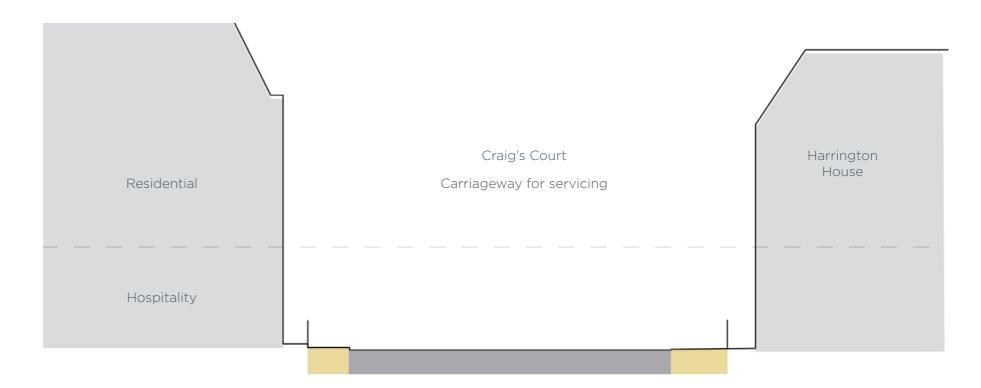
Existing section of Craig's Court indicating hard surface arrangement
